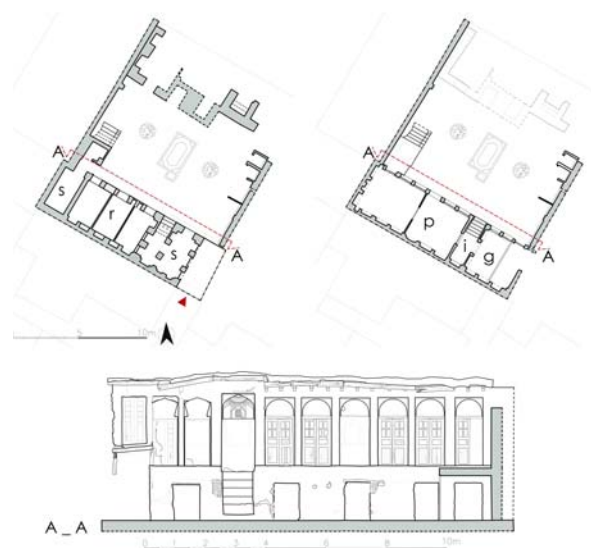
Nili's House: floor plans and façade, p: principal chamber, s: storage, g: guest room, i: *Iwan*, r: resting room
